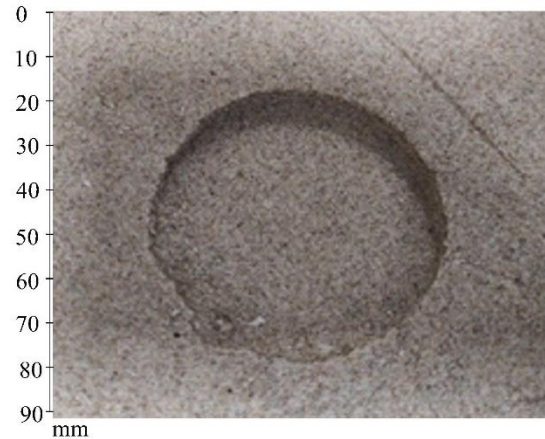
Failure shape of the footing with a 60-mm diameter
